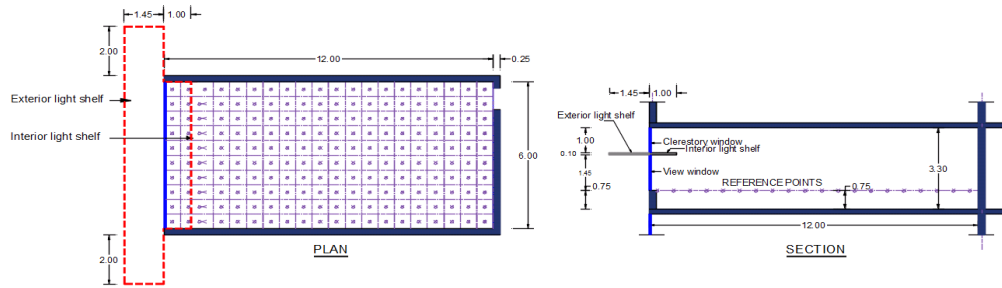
Hypothetical office building room plan and section is 300 lux, on which daylight autonomy
